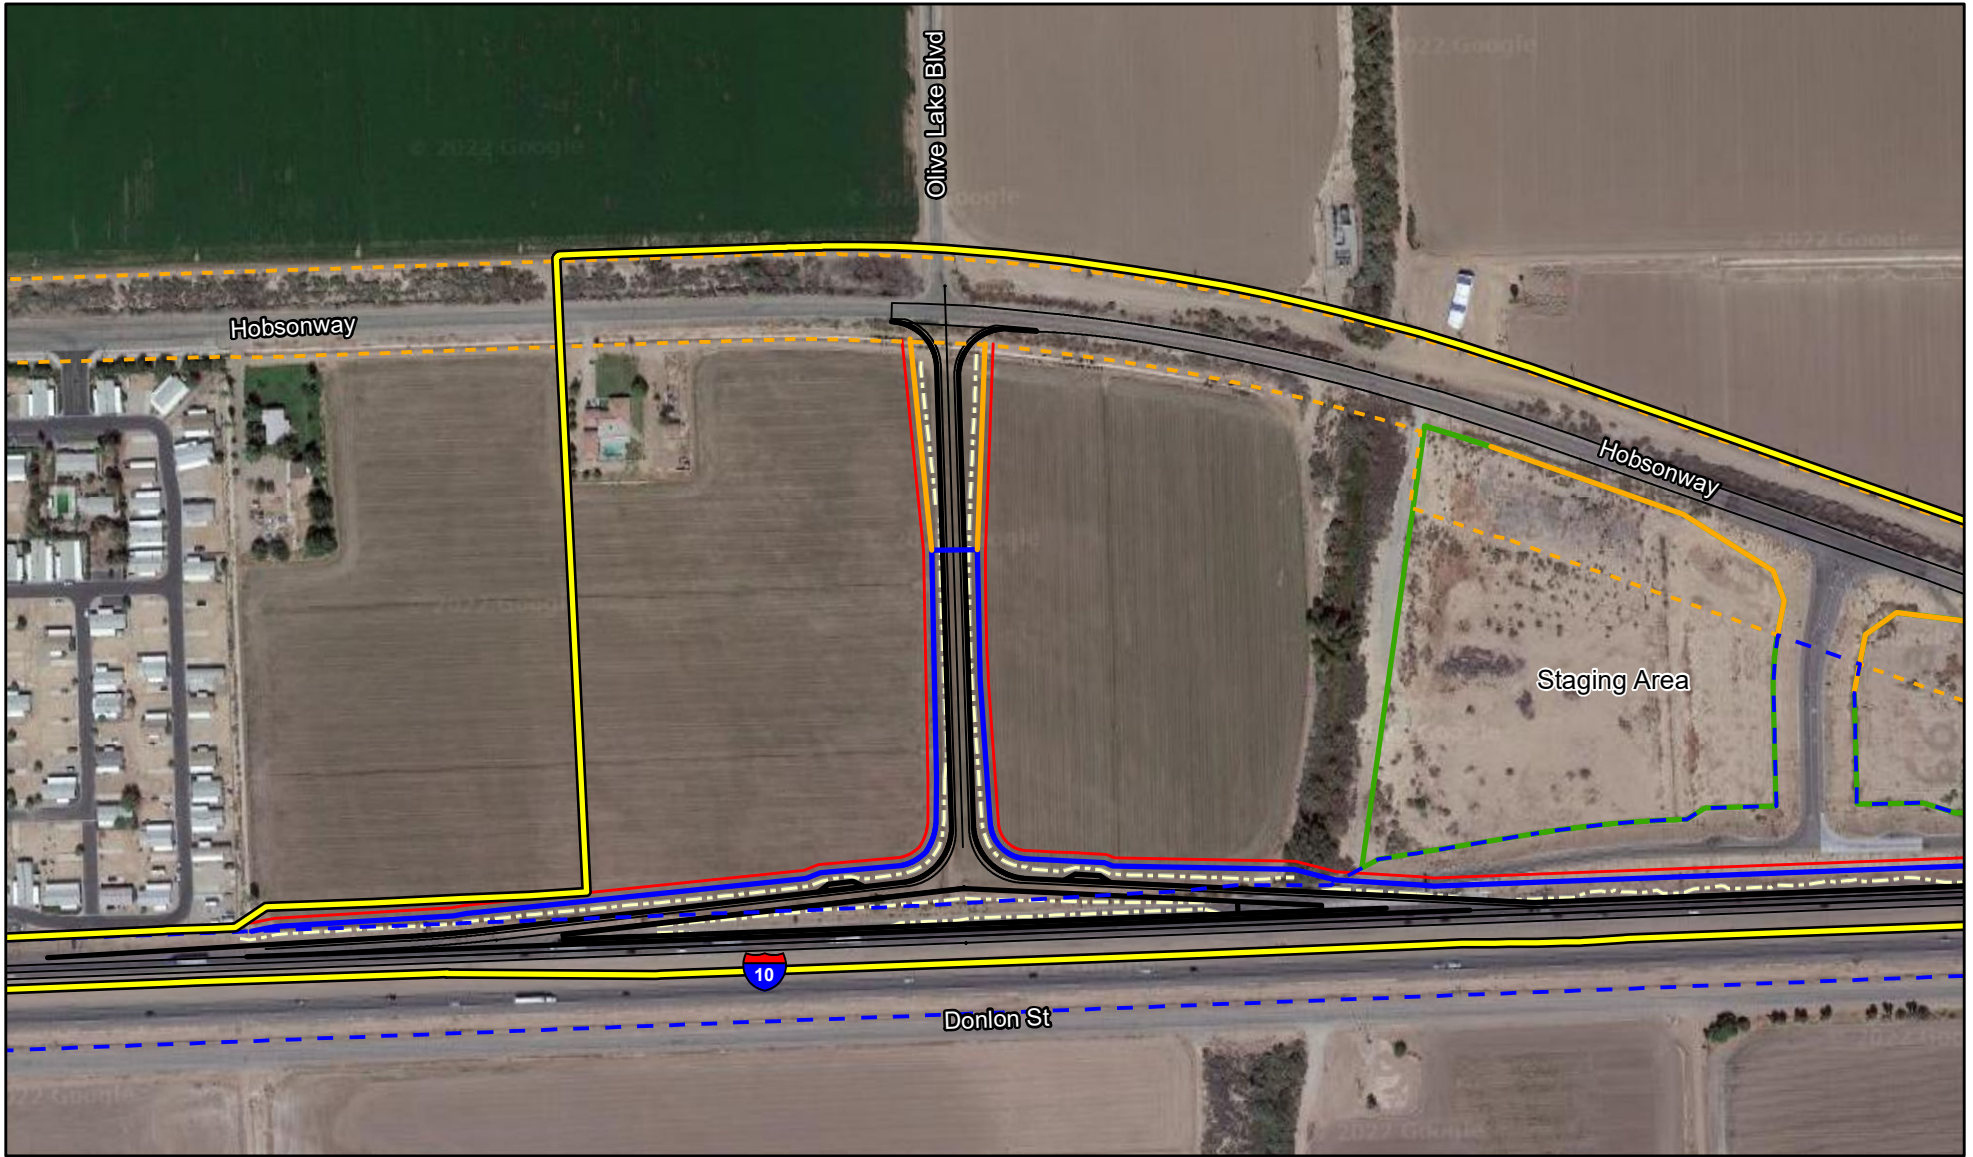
illustrates the relocated ramps that will connect Hobsonway and I-10.
